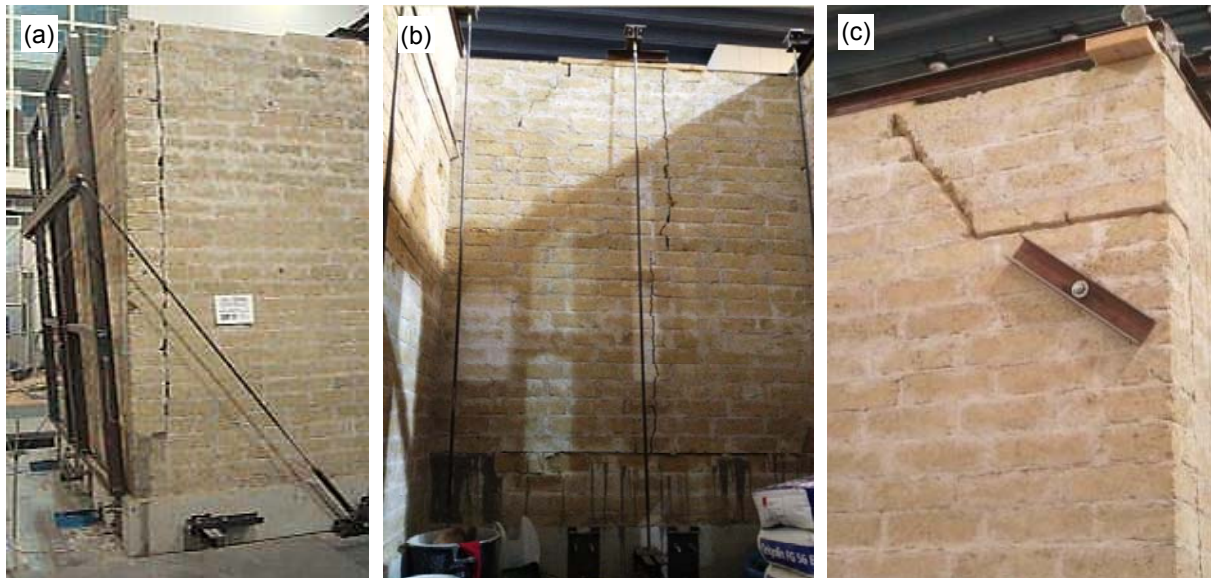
Damage pattern induced by shake table tests on the specimen strengthened with steel tie-bars: vertical crack at the corner separating the façade from the side walls (originated during tests on the unreinforced wall, a), vertical crack in the middle of the front wall (b), and diagonal cracks in the vicinity of the steel end-plates (c).
